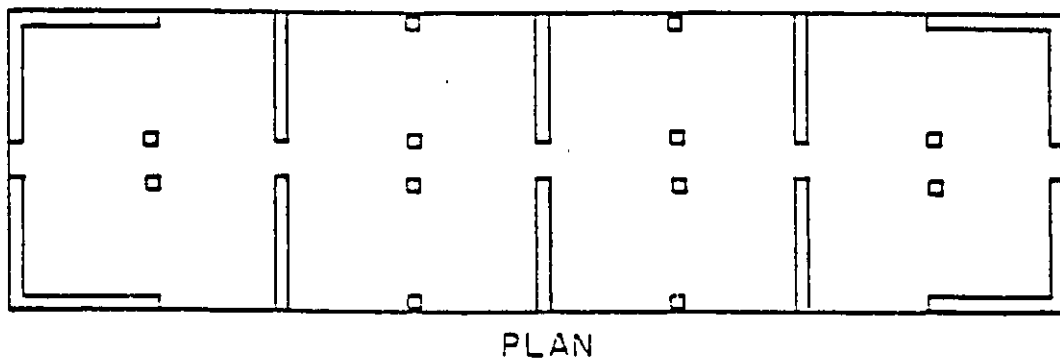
Common Use of Coupled Walls in Residential Buildings
